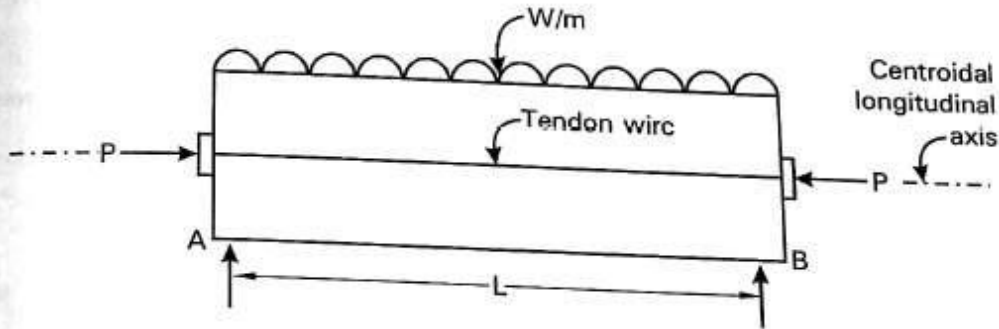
(a) Prestressed concrete beam with concentric tendon
